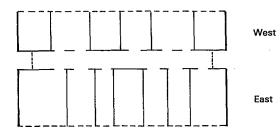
Modified planform for inertia calculation including corridor shear walls.
